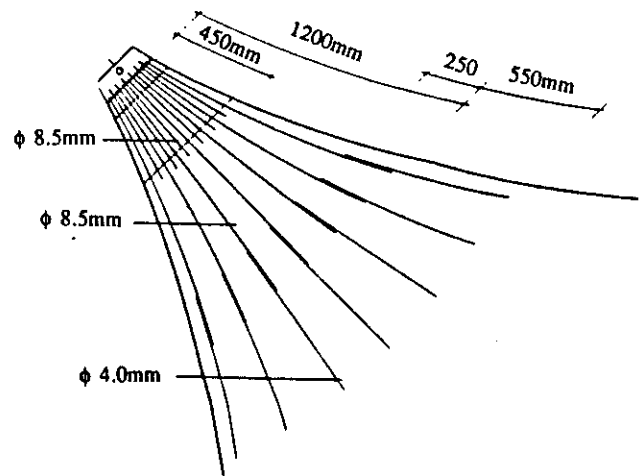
Ex. 3. Additional Reinforcement at Support.
